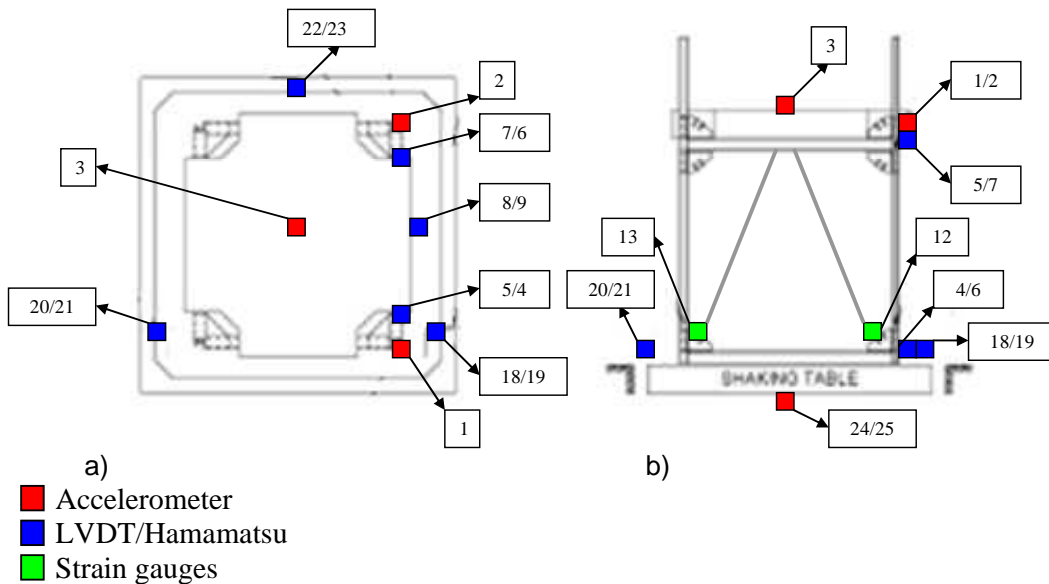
Instrumentation set-up of the SPECIMEN I at LNEC shaking table: a) Plan View and b) elevation.
